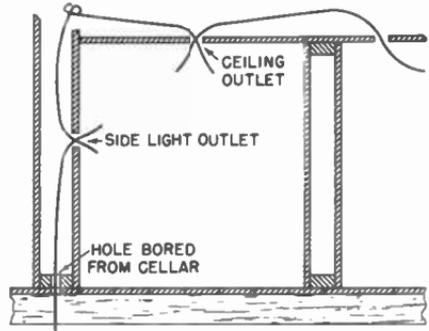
Armored cable can be fished from outlet to outlet through the walls by using fish tapes and "snakes".
